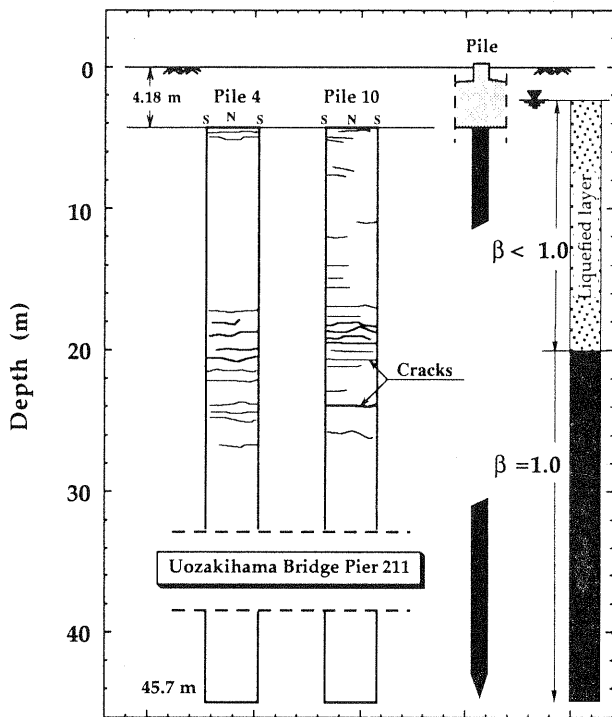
Crack distribution in the bored piles at Bridge Pier 211 in Uozakihamama Island
